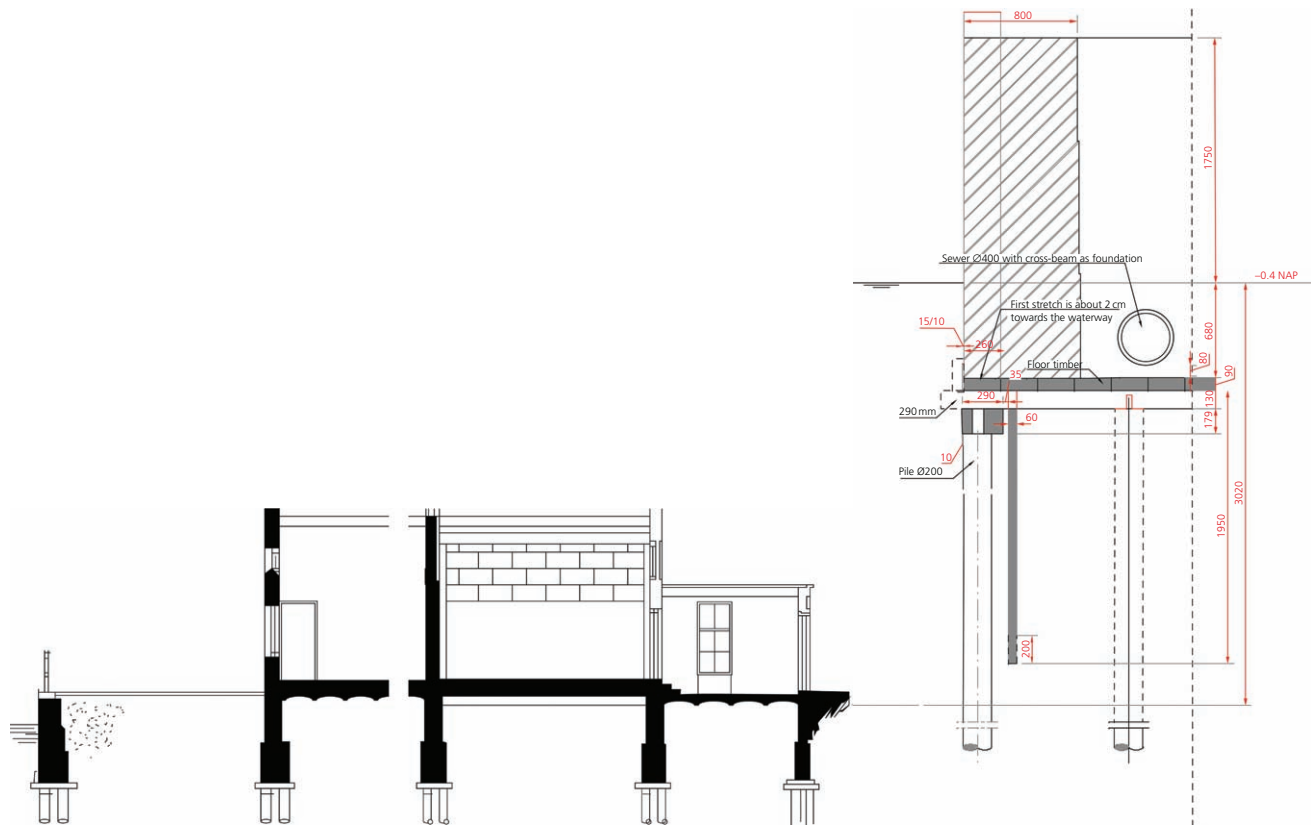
Cross-section of the quay wall according to historic evidence (the quay was built around 1875) on the left, and cross-section according to divers' inspection with dimensions on the right (dimensions are in mm). NAP, Amsterdam Ordnance Datum
